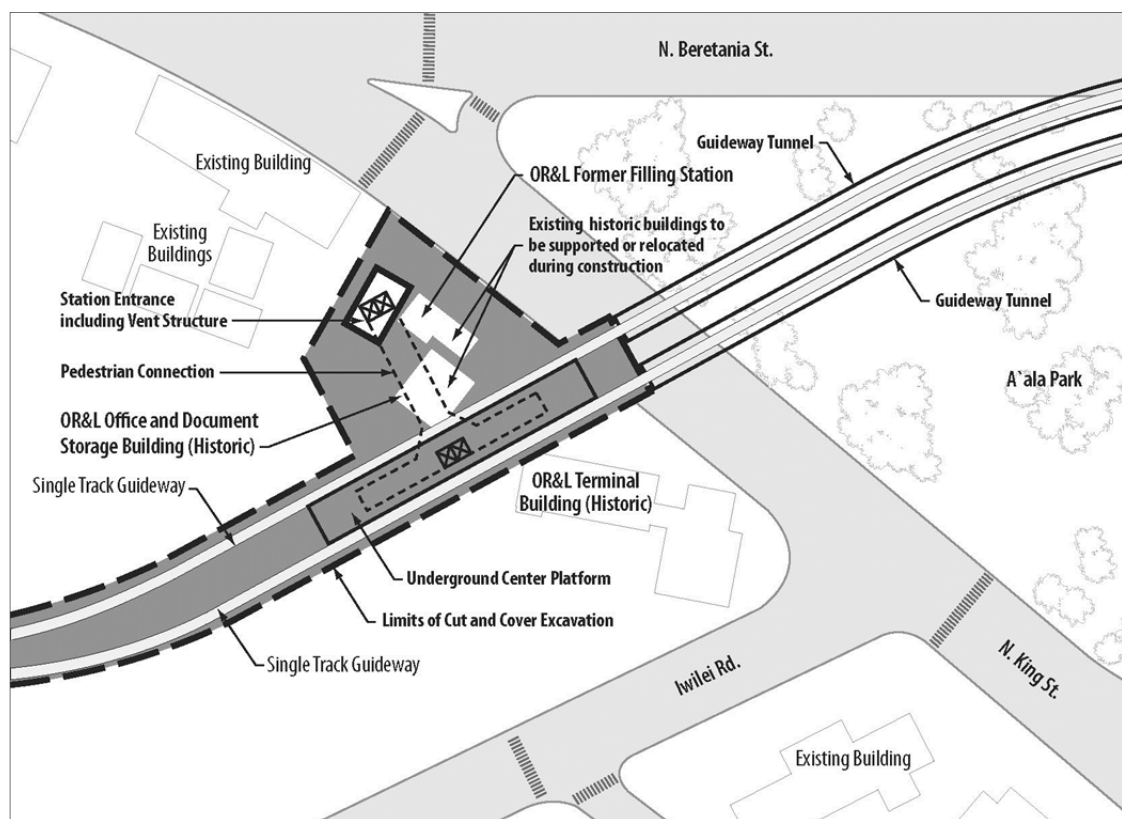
Beretania Street Tunnel Alternative Ka'aahi Street Station
